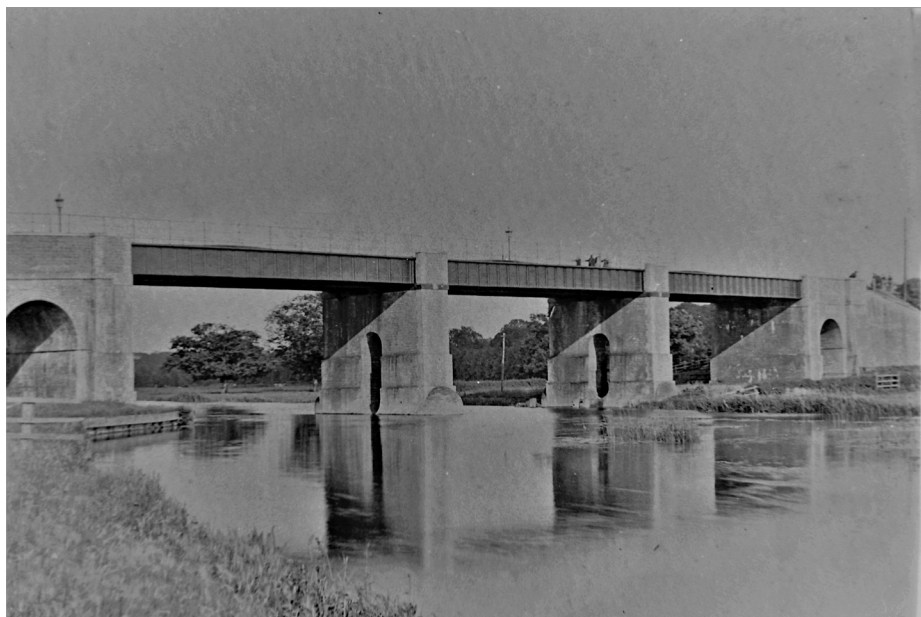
Bridge 76, ca 1892. Photo: E.J. Brett, courtesy Roger Guttridge.
